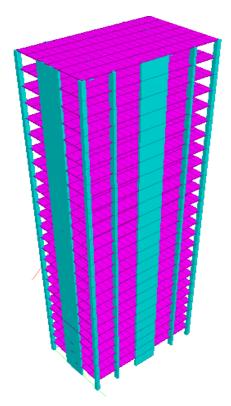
Orthogonal view of Flat plate with Shear wall model in STAAD
